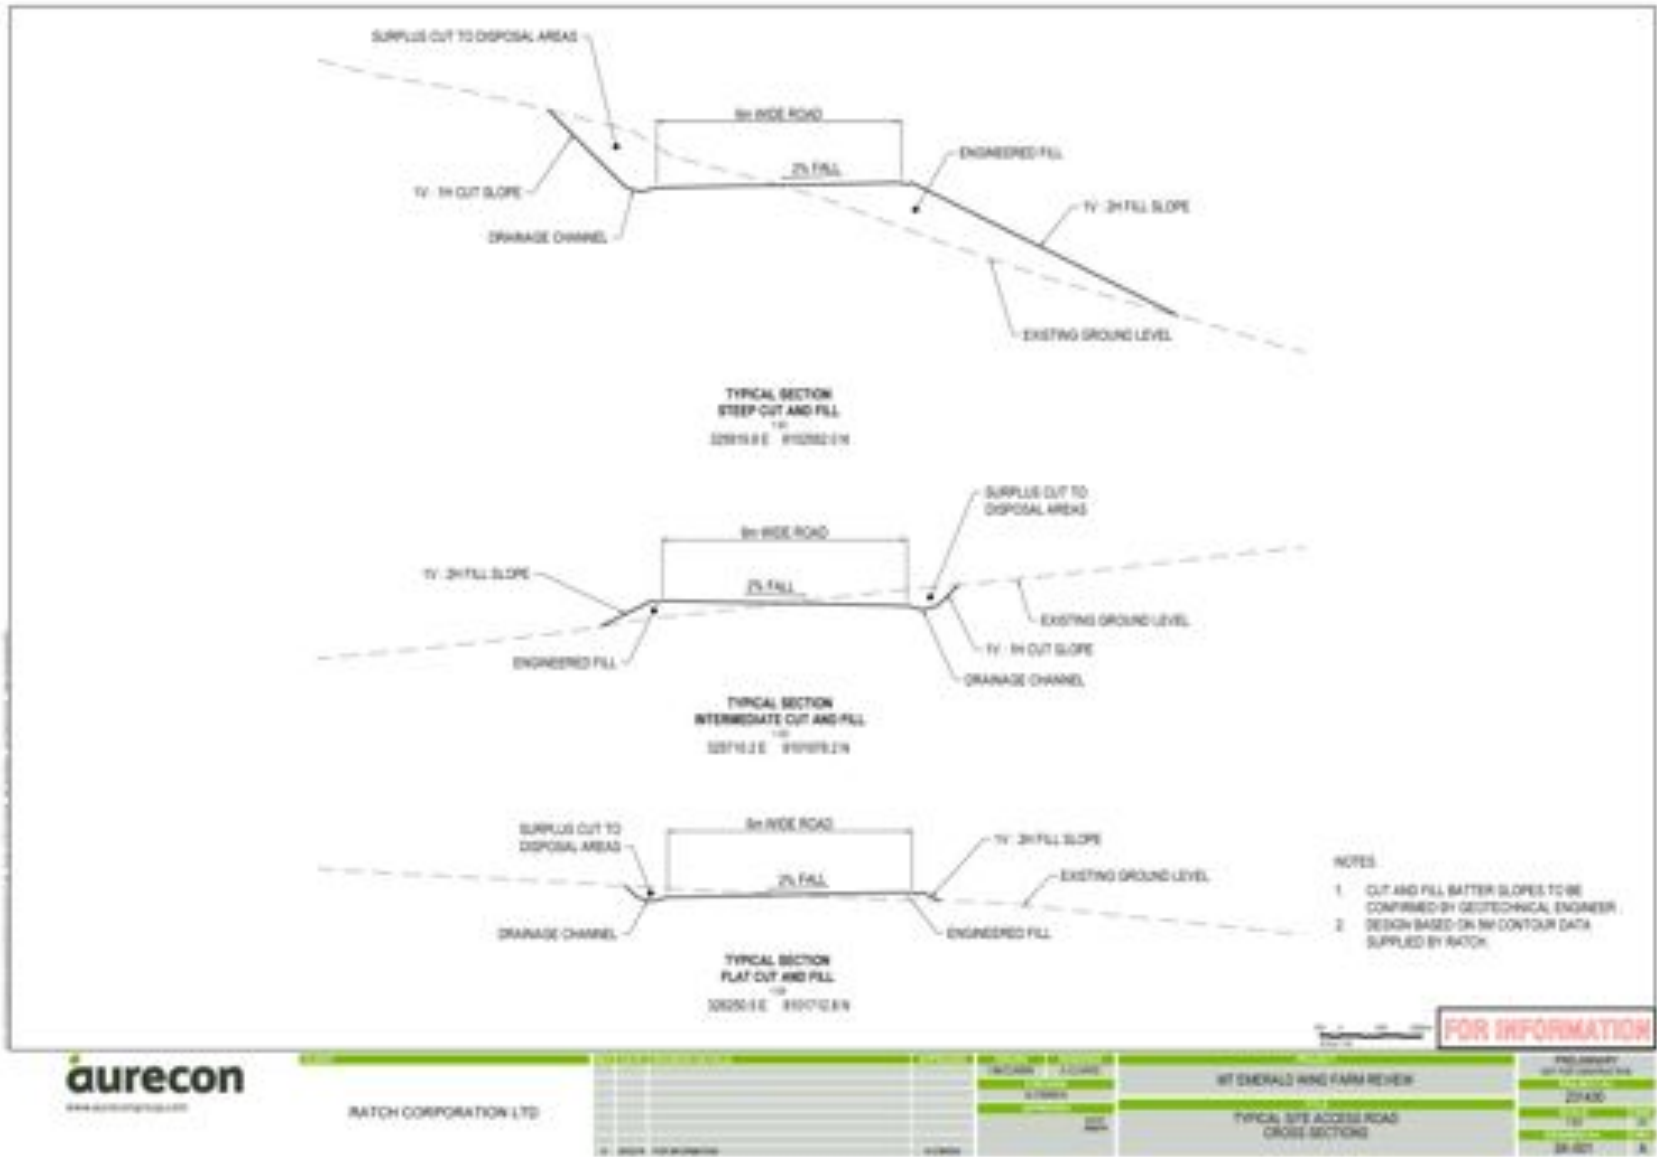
Typical Site Access Road Cross Sections for the MEWF
